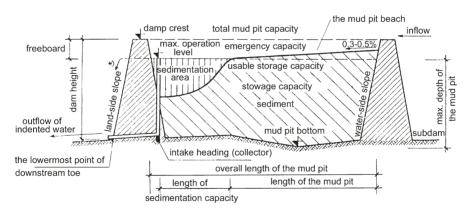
Drawing describing a mud pit of a coal processing plant [12].
